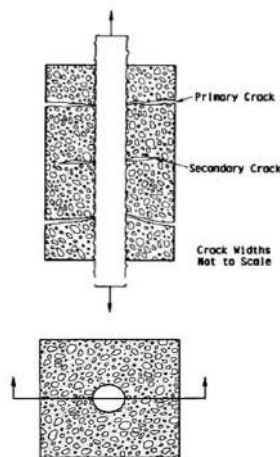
Primary and secondary cracks in reinforced concrete elements that experience tensile stress [11]
